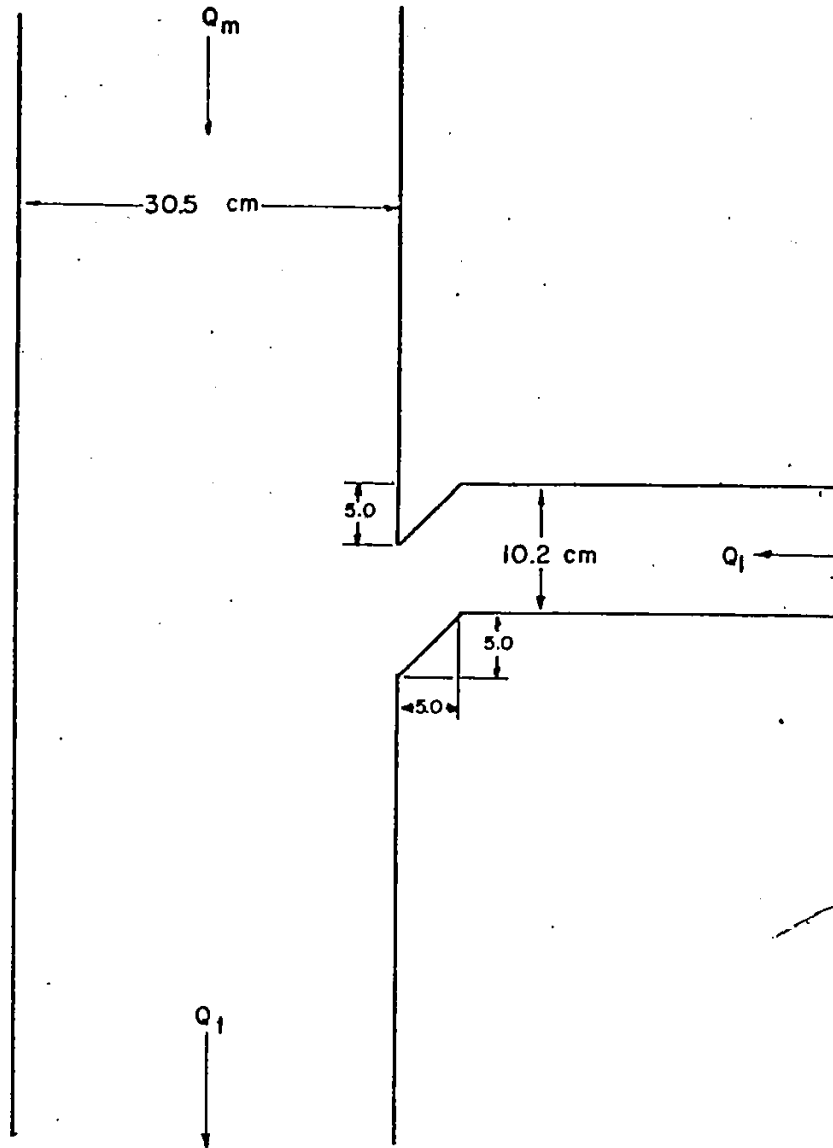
Plan View of Beveled Outlet with Large Deflection Wall
